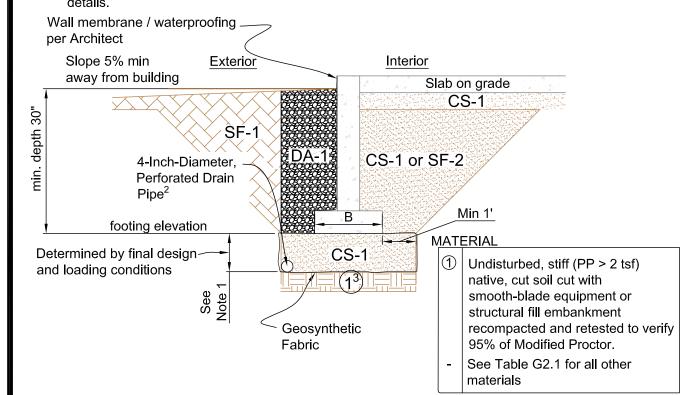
Soil Improvement Schematic - Continuous Perimeter Foundations
